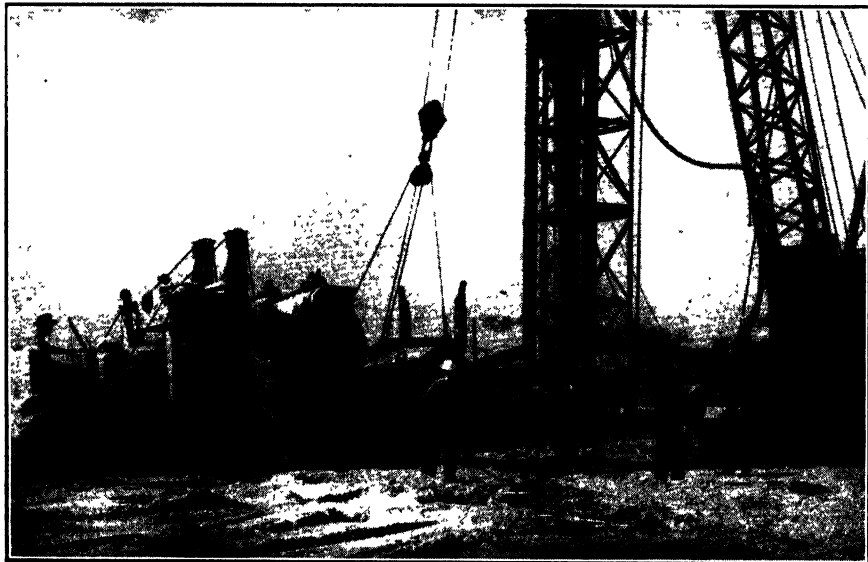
Filling with sand the loading skip of the sand-drain driving rig shown in Fig. 19-6. (Courtesy of O. J. Porter.)
